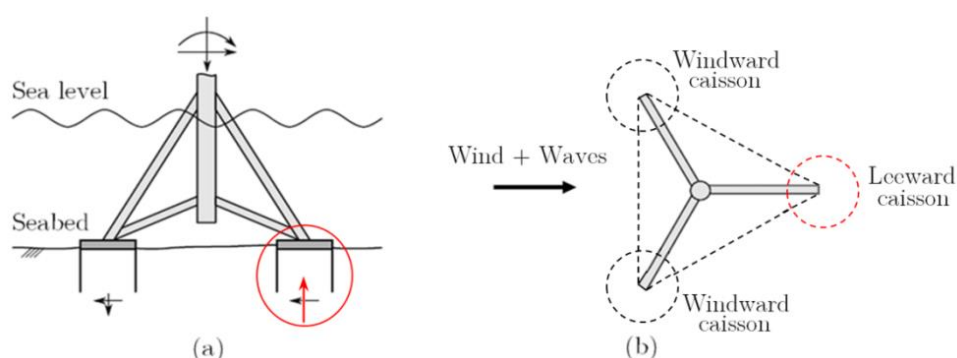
typical tripod foundation: (a) Elevation view, (b) Plane view with the modelled part (red)[56]
